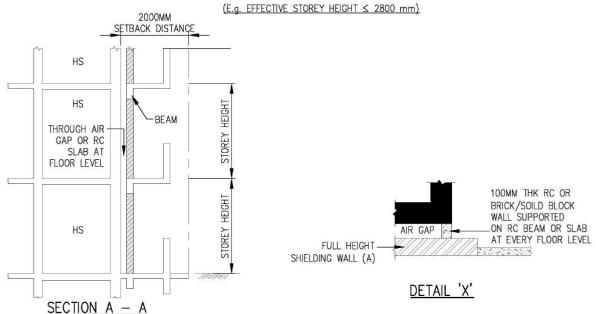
(b) DOWN-HANG BEAM LOCATED AWAY FROM EXTERNAL BUILDING LINE
